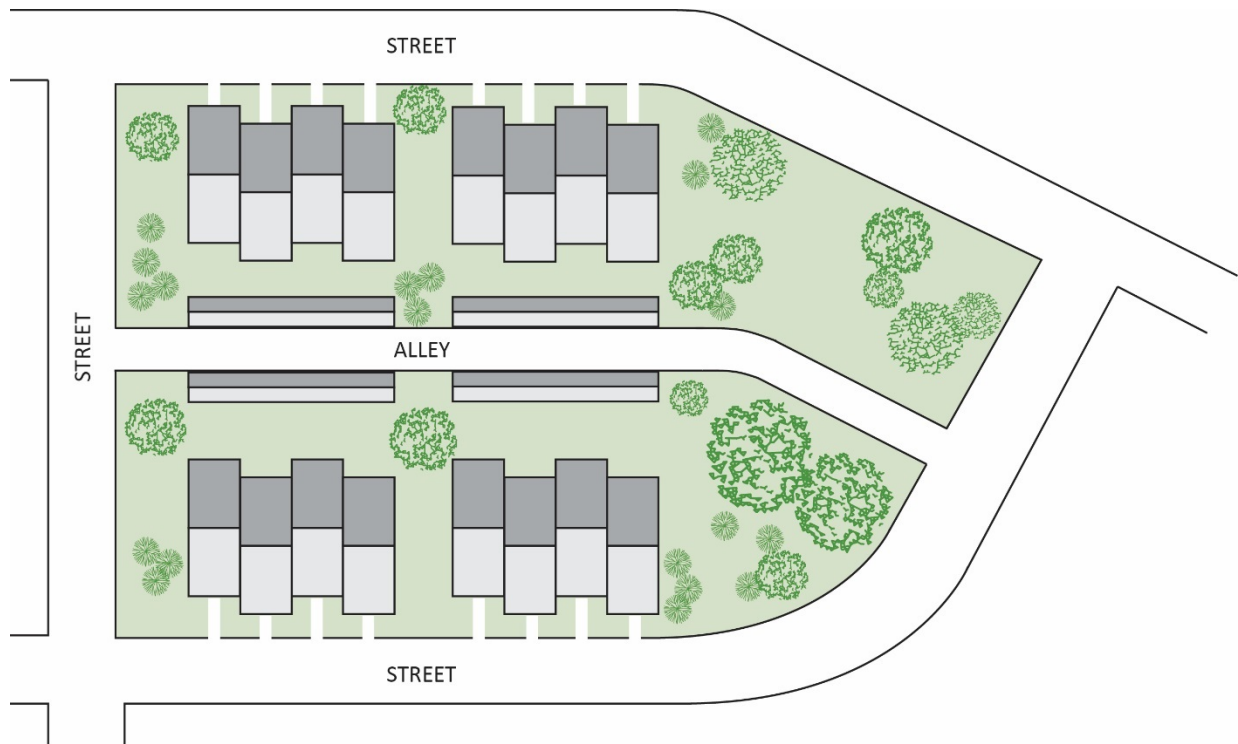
4 - Example of Site Plan – Townhouse Dwelling
